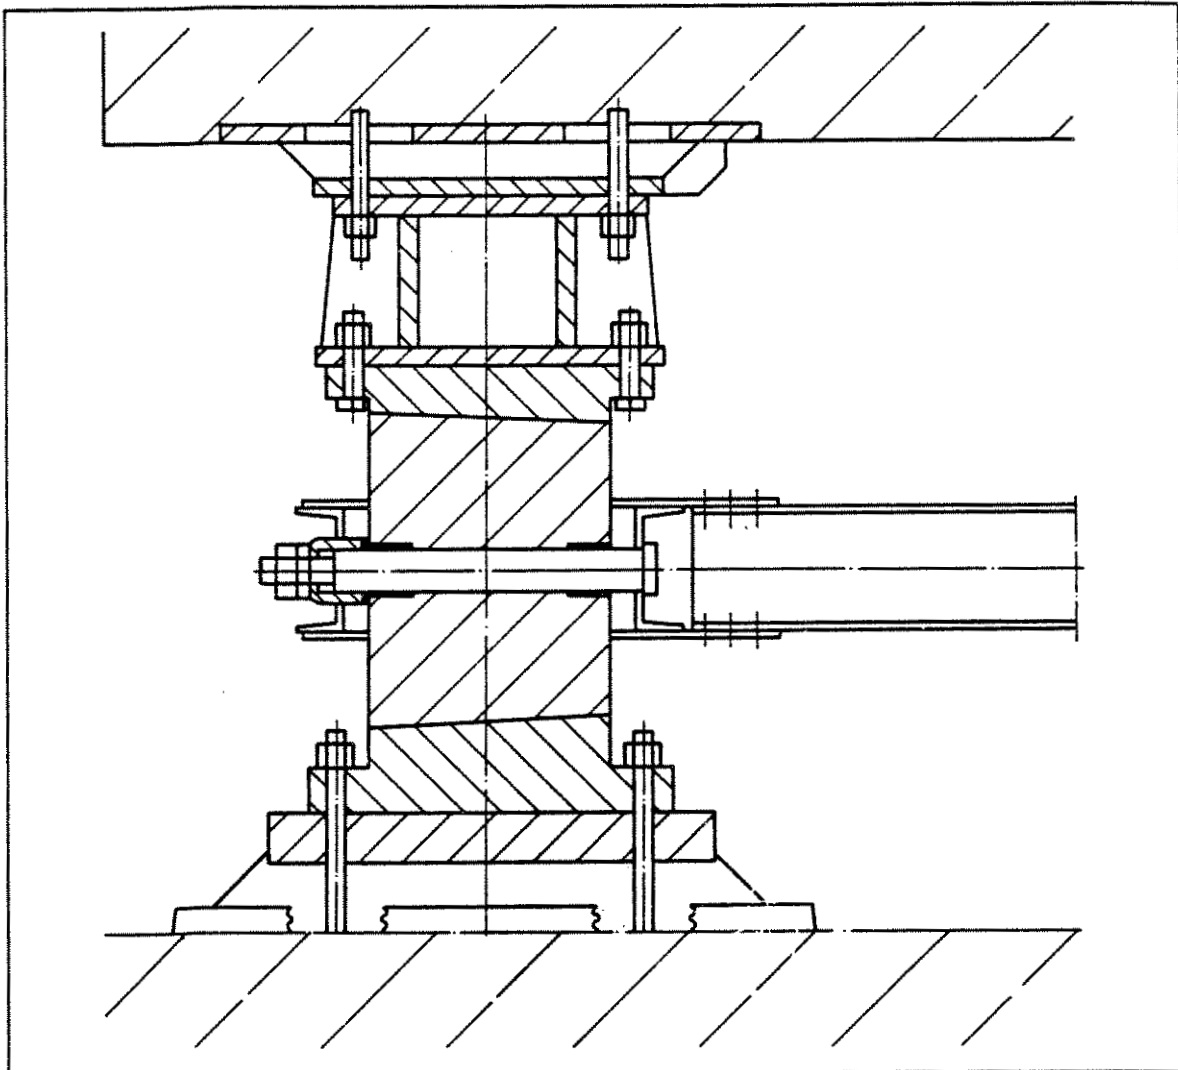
Shatt-Al-Basrah bridge, detail bridge bearing
